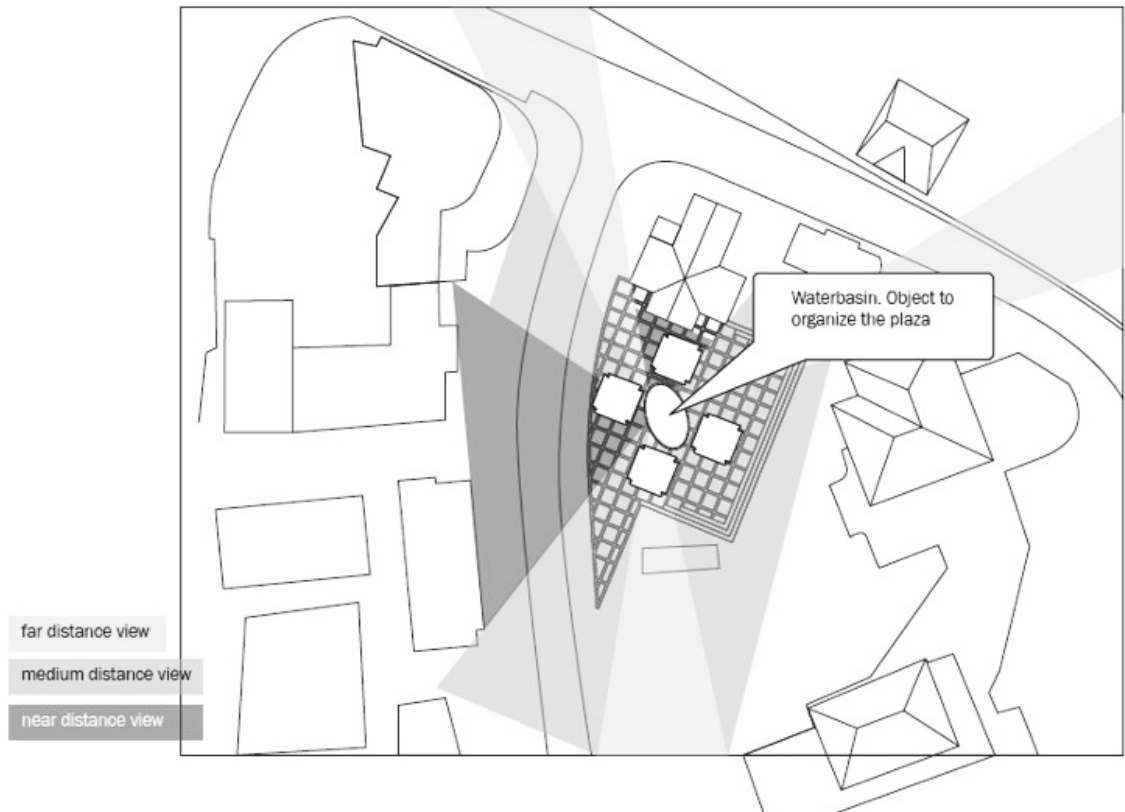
ORE, Popup Fashion Stores Shanghai Fashion Week, Shanghai, CN, site plan, SPAN2015
